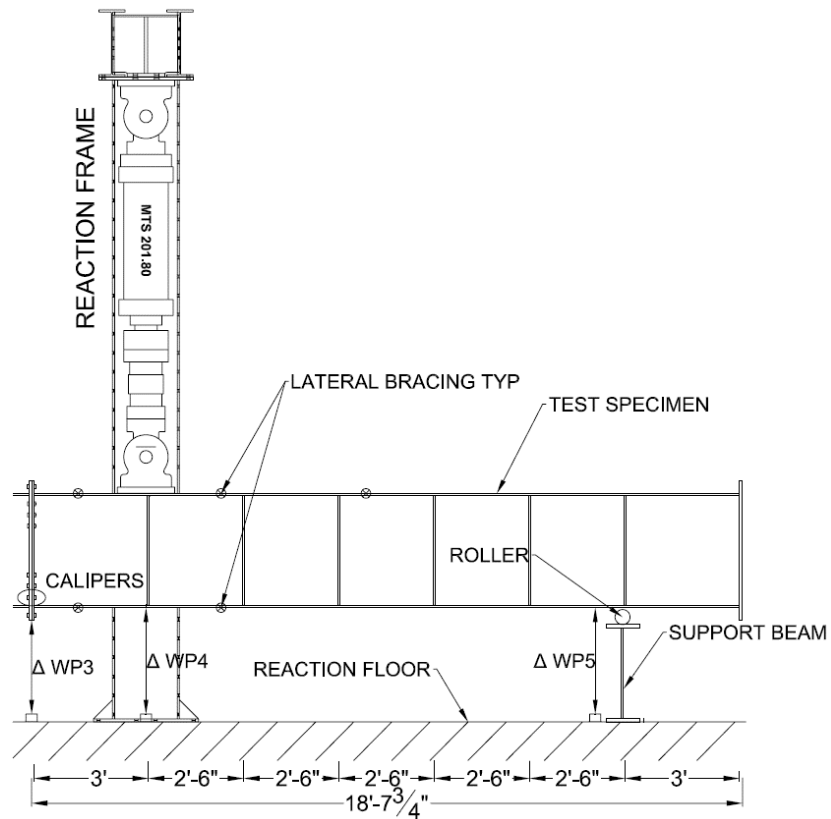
Half Diagram of Shallow Beam Test Setup
